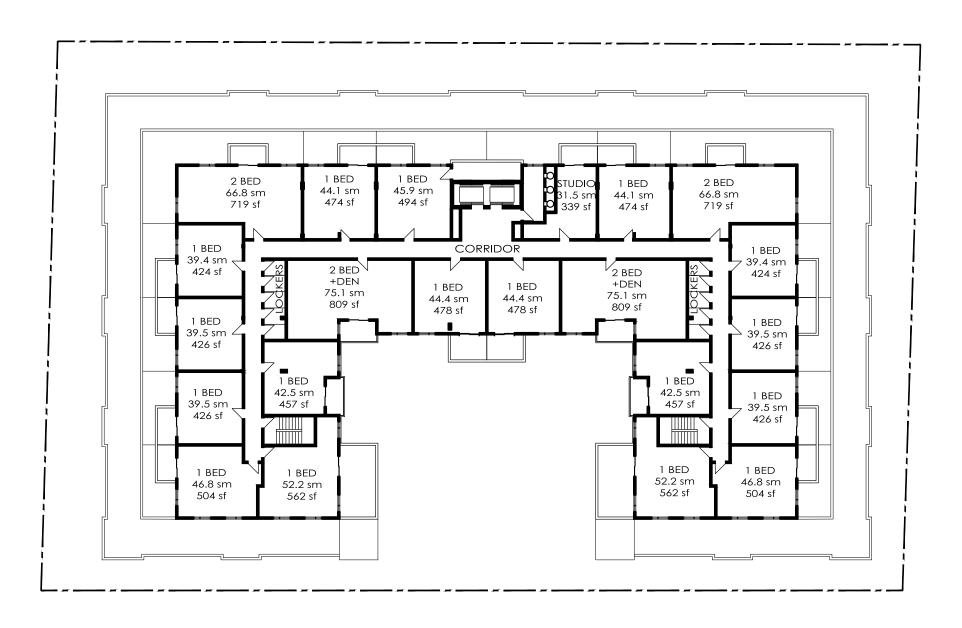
Sixth Floor Plan prepared by Lintack Architects Inc.
